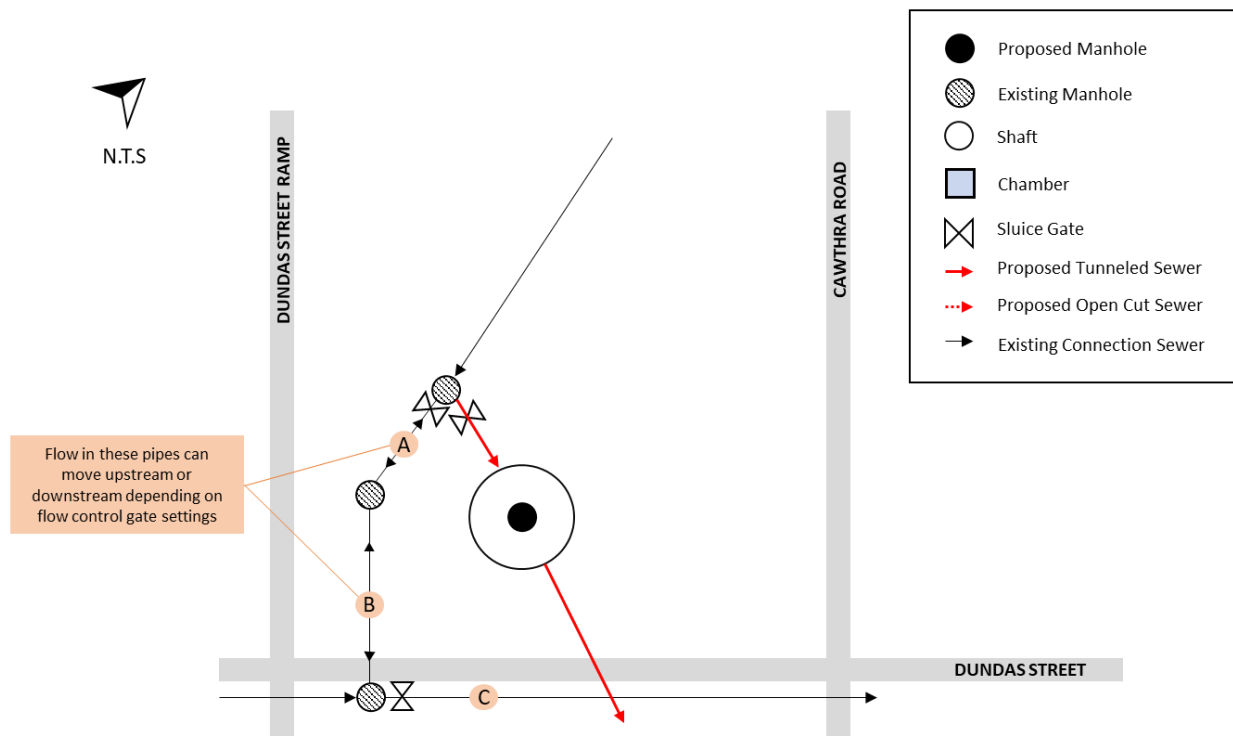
Cawthra Road and Dundas Street East Connection Type Schematic
